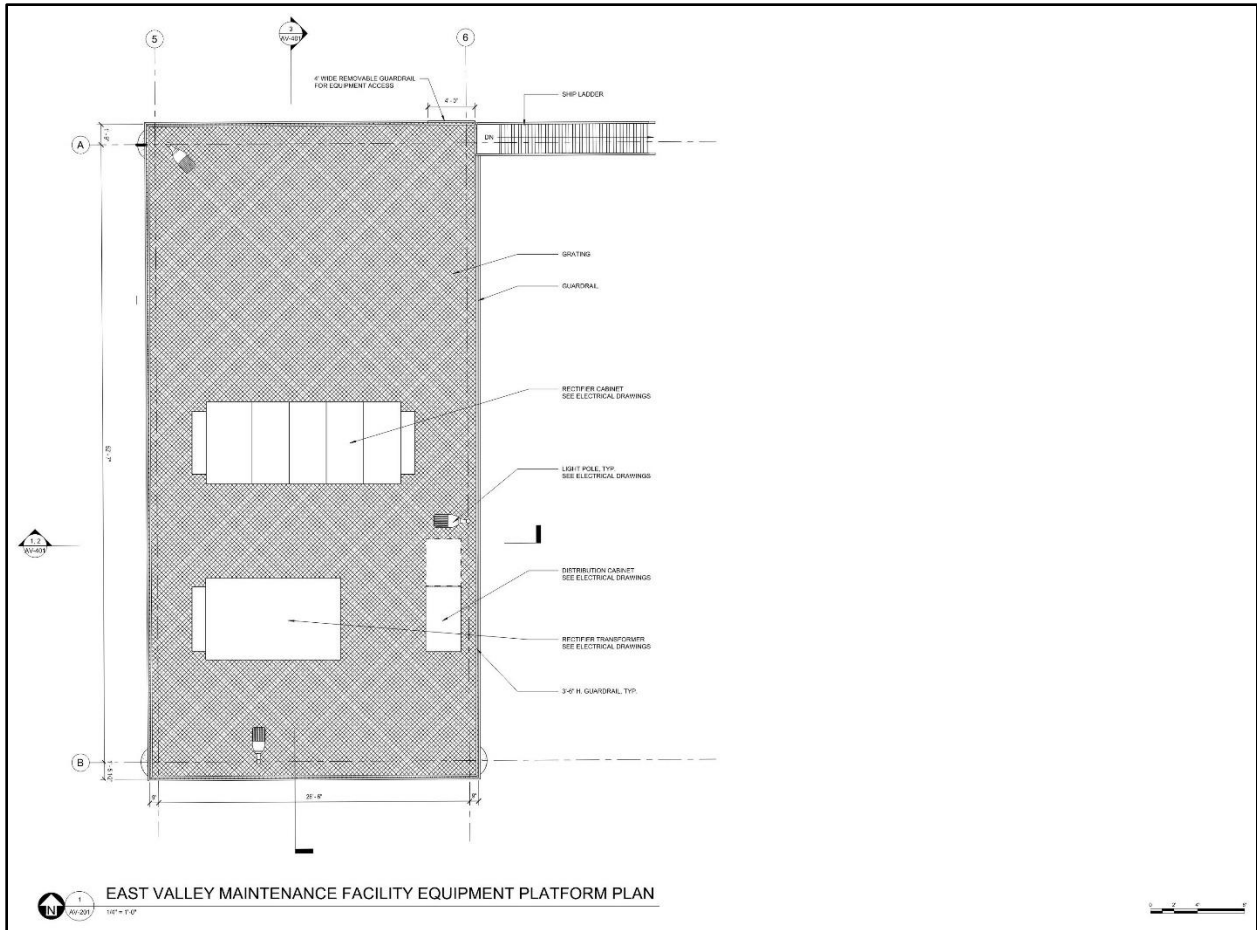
East Valley Maintenance Facility Equipment Platform Plan
